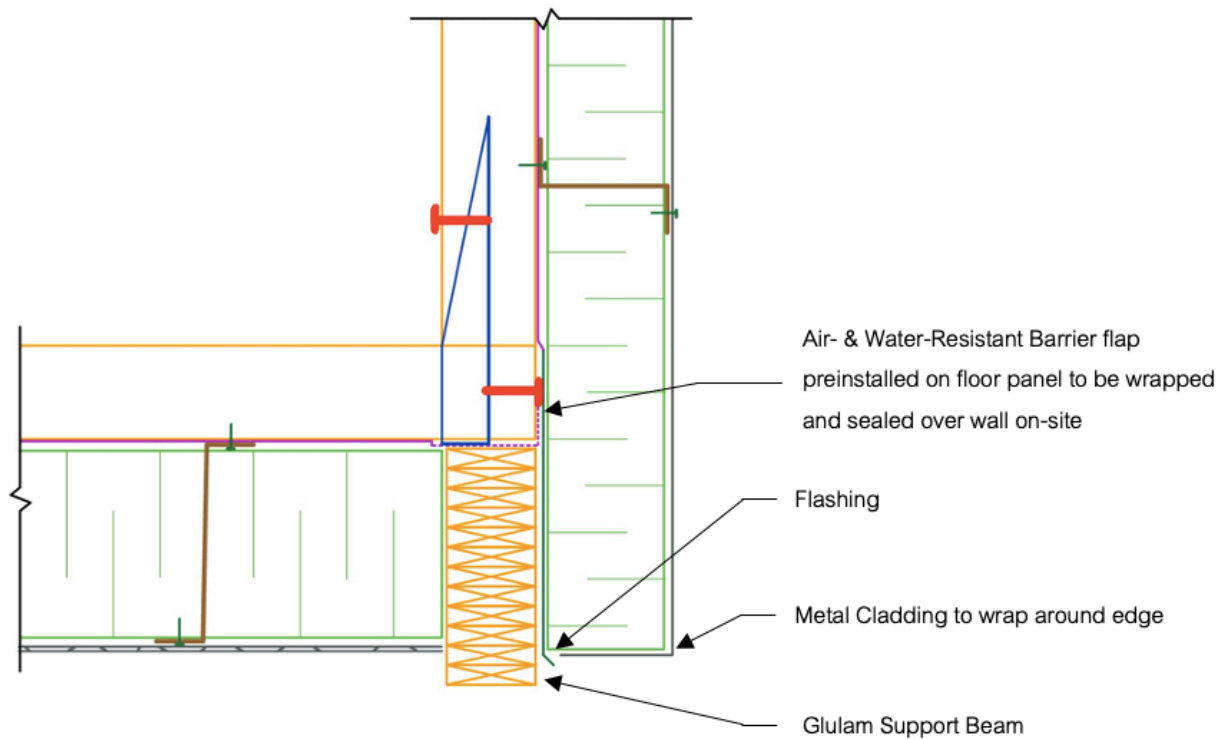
Floor to Wall Panel Enclosure Connection
